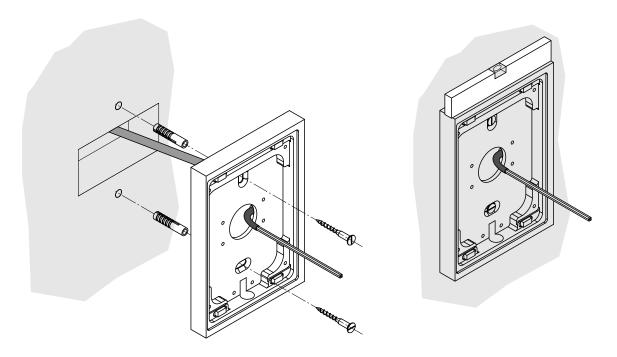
Mounting the on-wall mounted housing (Figure shows attachment to masonry)
